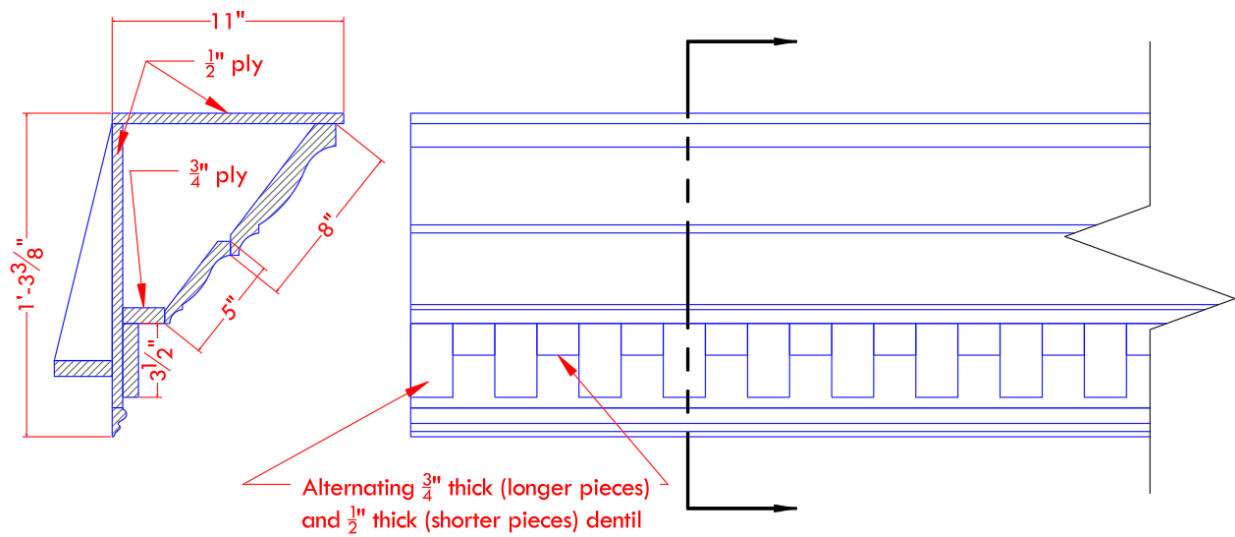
Crown moulding drawing, Front (right) and Section (left)
